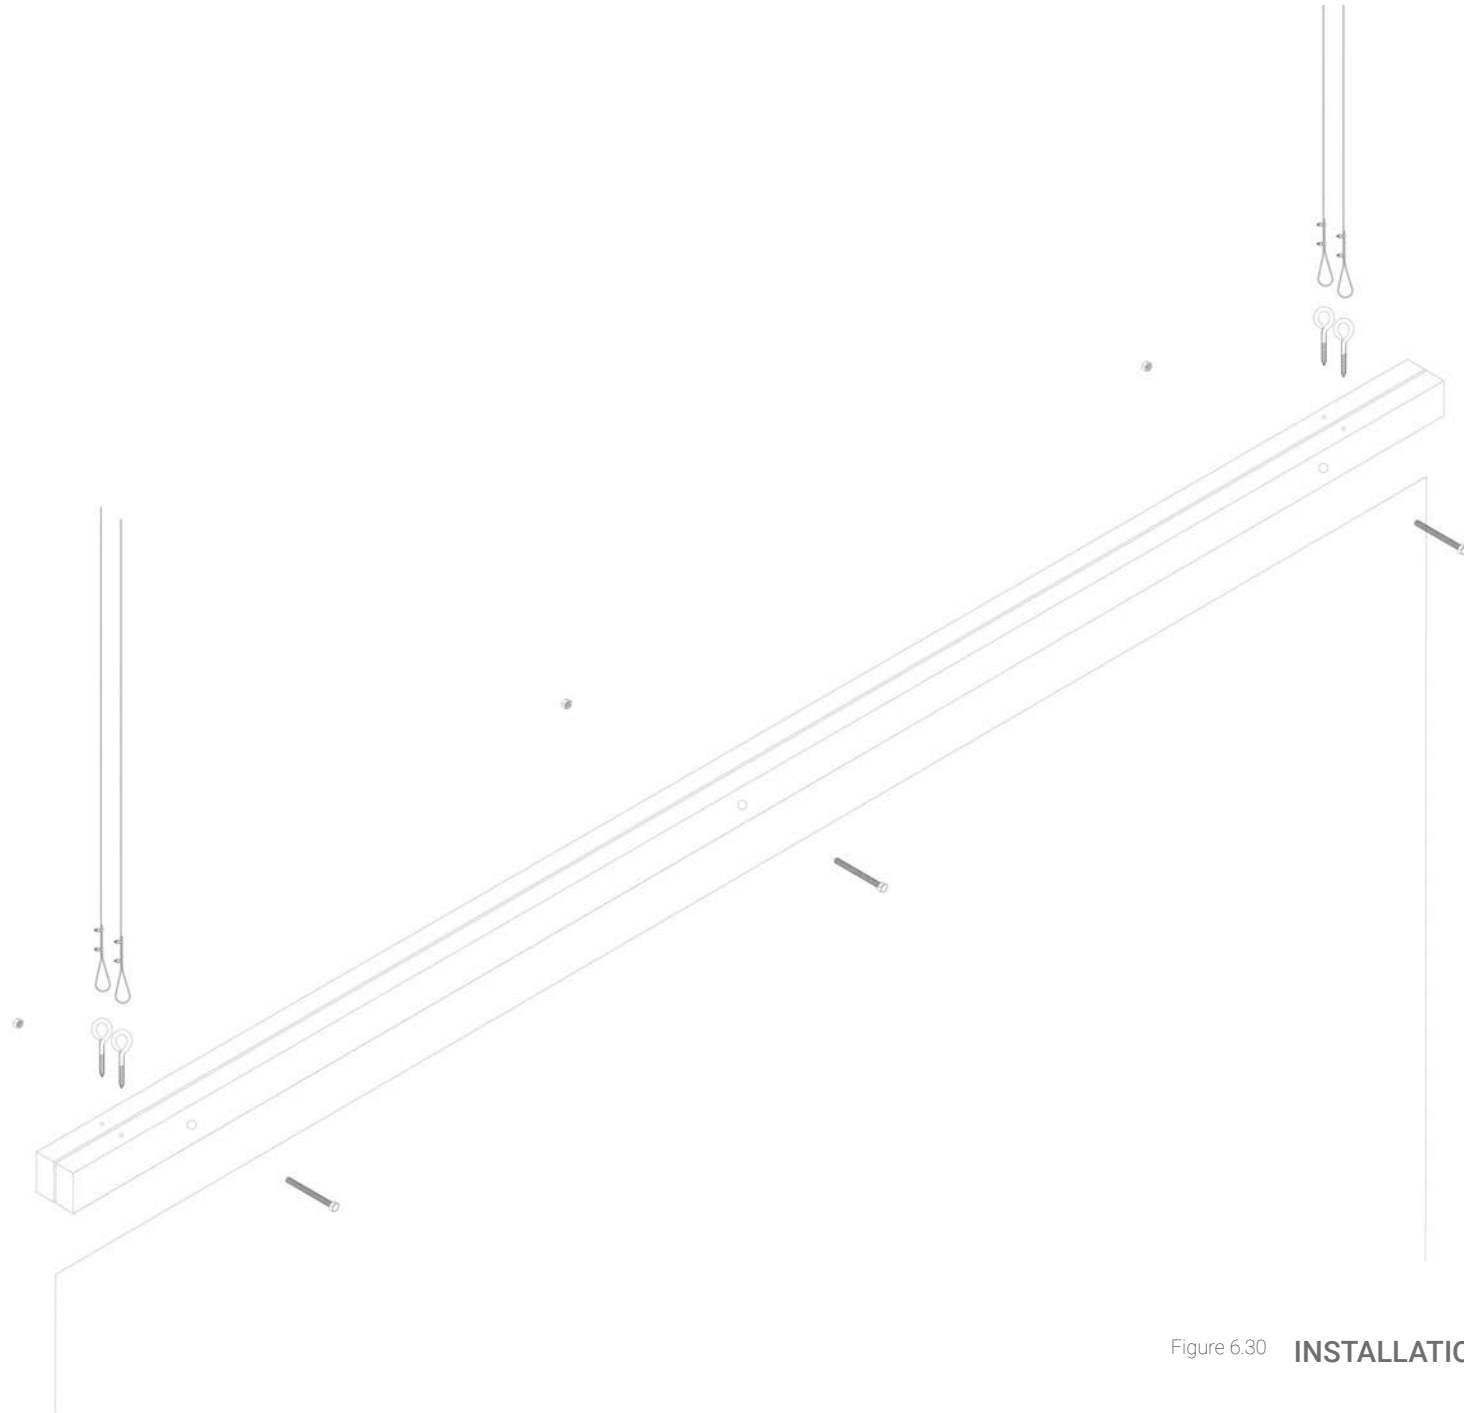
INSTALLATION DETAIL ISOMETRY 1:6
